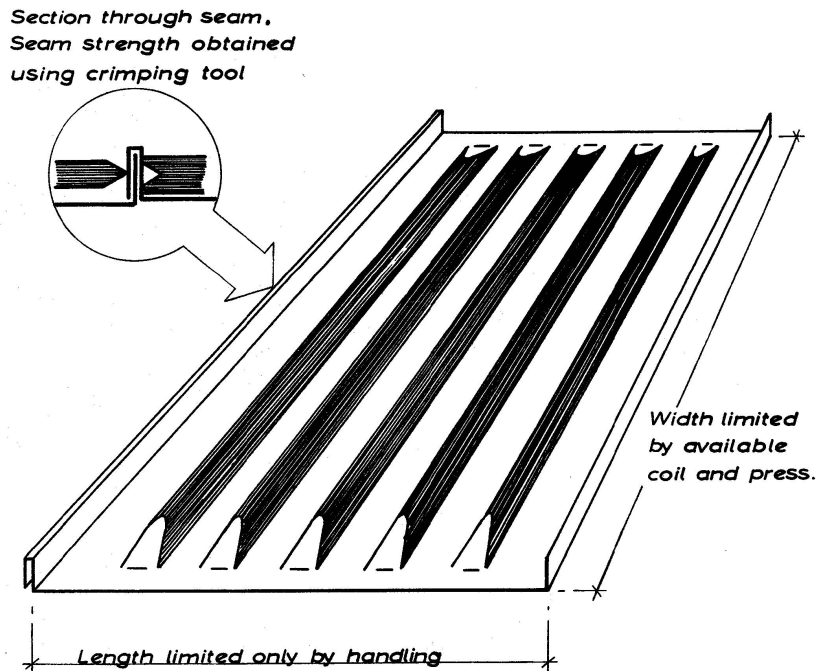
Ideal Arrangement of Sheetting for Folded Plate Construction.
